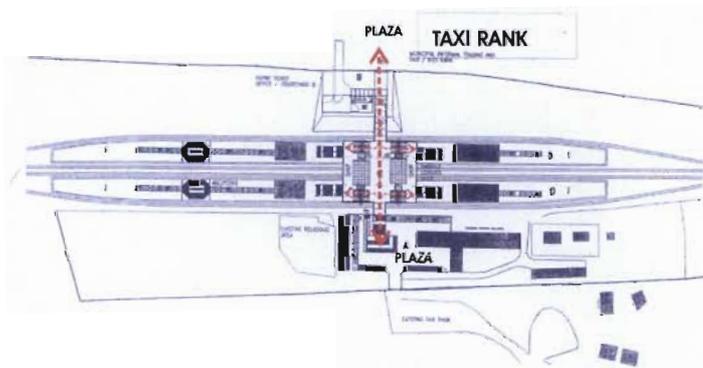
The Station ground floor plan indicating routes to the platforms through the turnstiles, on either sides of the main thoroughfare. (Author / Wale, 1998:26)
